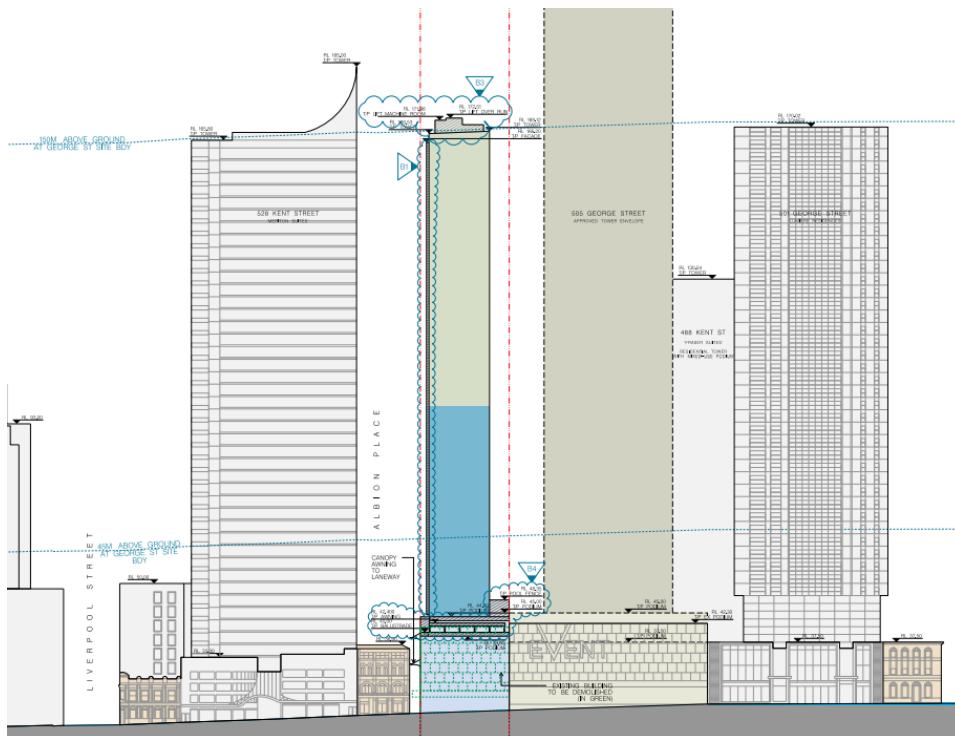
Proposed George Street (east) elevation, areas to be modified clouded
